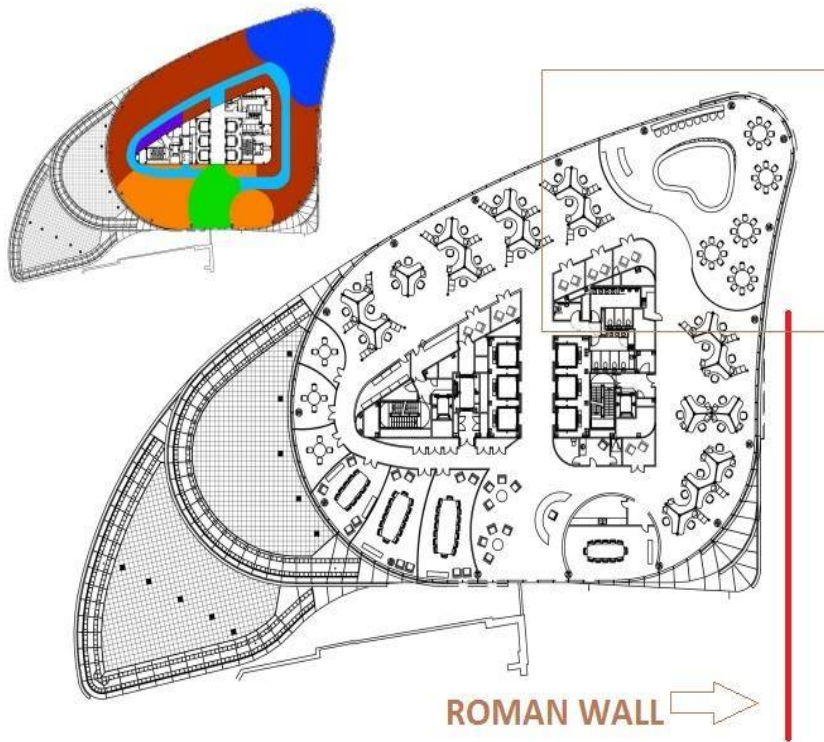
Floor Plan of One London Wall .with the arc of the building hiding the Roman structure for street view (Extract of coroflot with my adaptations)¹
